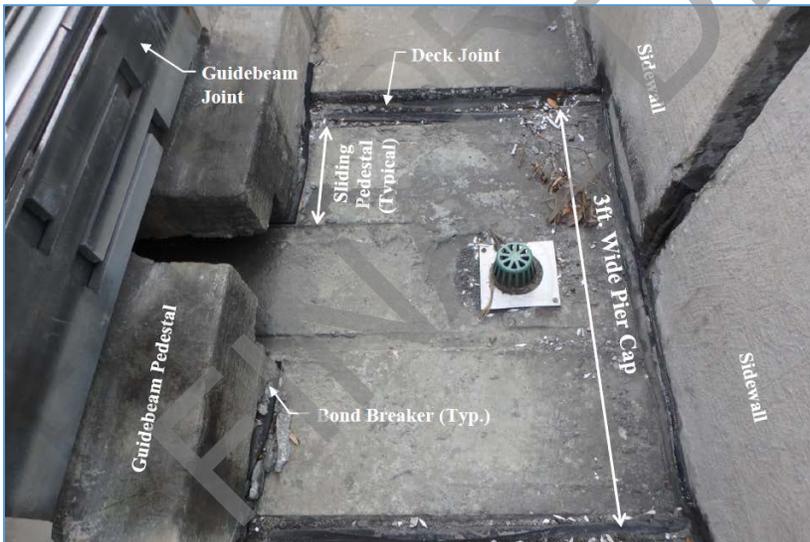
TYPICAL DECK DRAIN PLACEMENT
